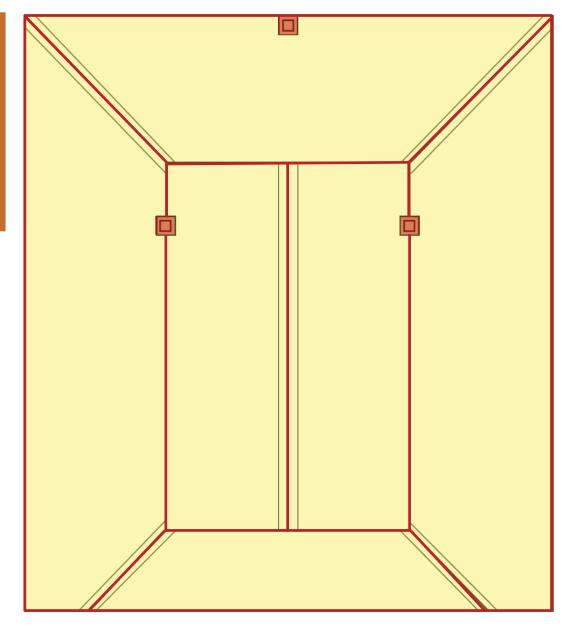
Roof plan significance ranking. NOT TO SCALE.
